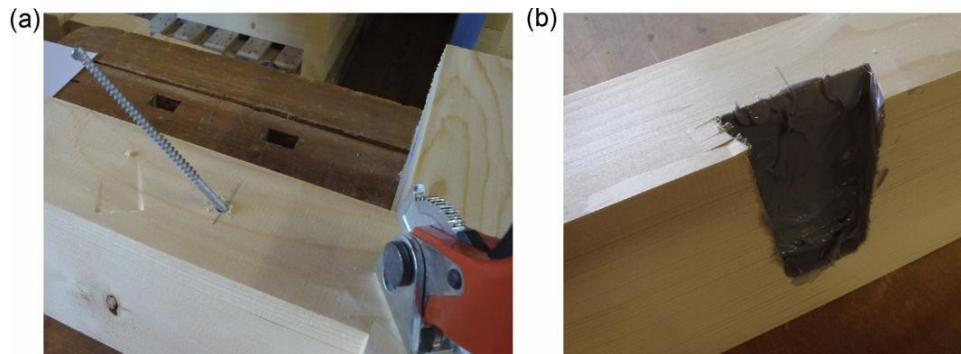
Detail showing reinforced RDJ: (a) use of STS; (b) use of adhesive layer. (Tannert and Thomas, 2016) [20]
